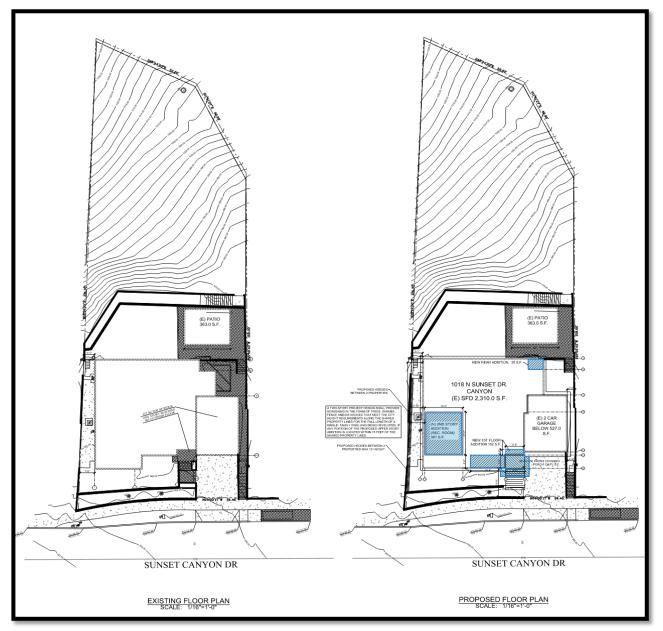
Site plan of the proposed development with first floor and second story additions shown in blue.
